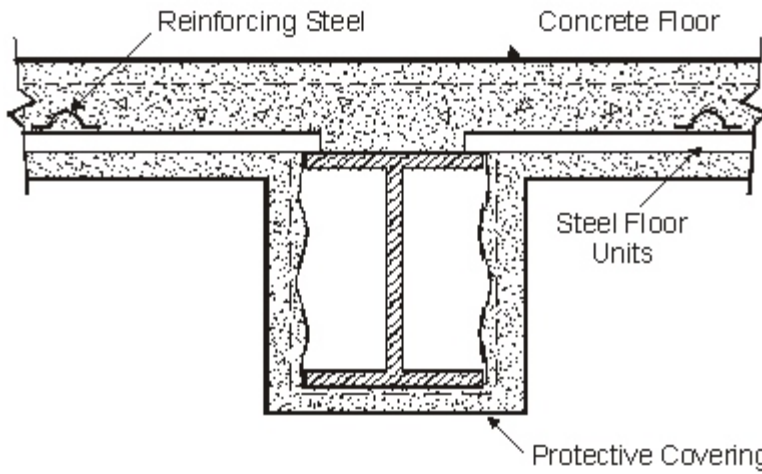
Encasement of a Steel Beam by Monolithic Casting of Concrete Around the Beam
